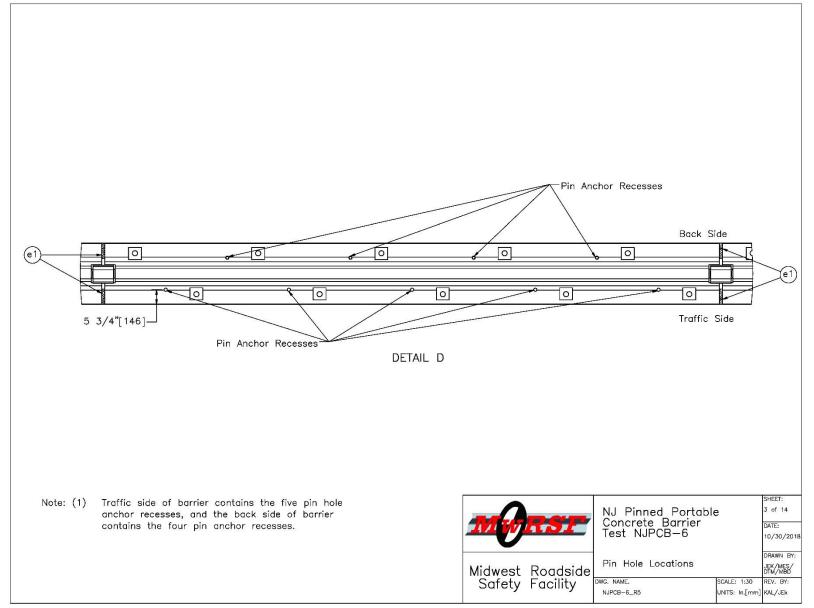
PCB Pin Anchor Locations, Test No. NJPCB-6
